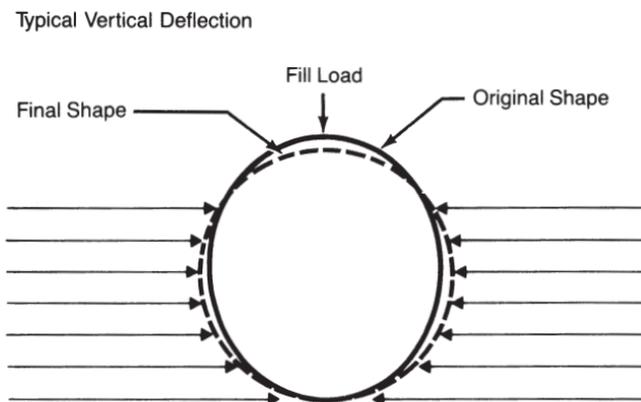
Corrugated steel pipe functions structurally as a flexible ring which is supported by and interacts with the compacted surrounding soil. The soil constructed around the pipe is thus an integral part of the structural system. Therefore it is important to insure that the soil structure or backfill is made up of acceptable material and that it is well-constructed.
